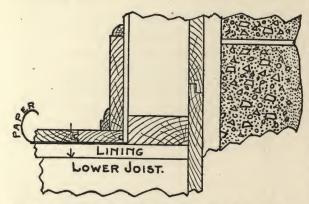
Section showing the lower joist, lining, paper, flooring, base board and quarter round, sheathing and block at union of the first floor level.
